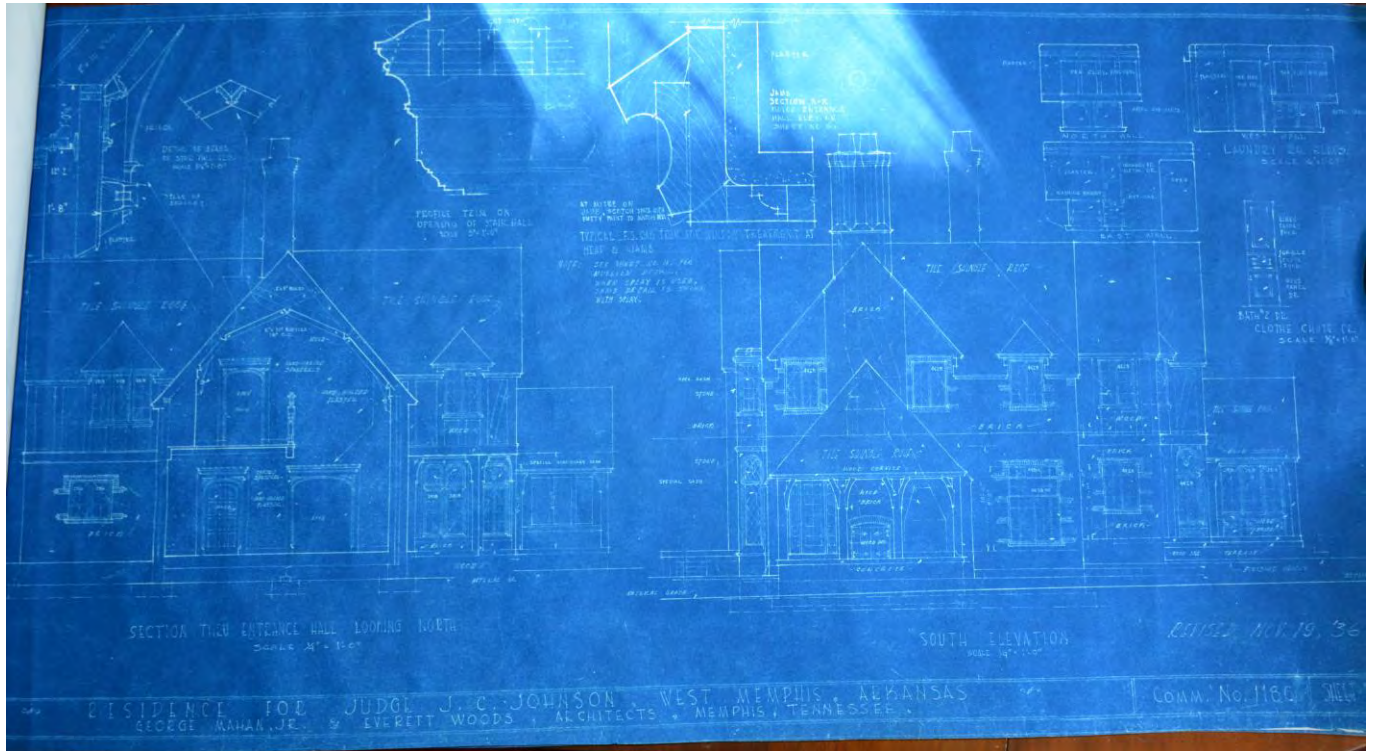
South Elevation and Section Drawing, Johnson-Portis House, 1936.
